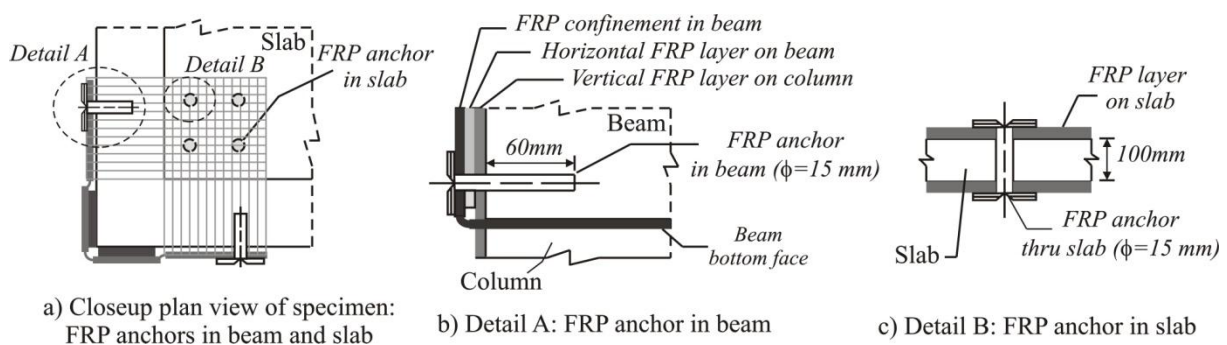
Details of FRP anchor dowels installed in slab and beam elements
